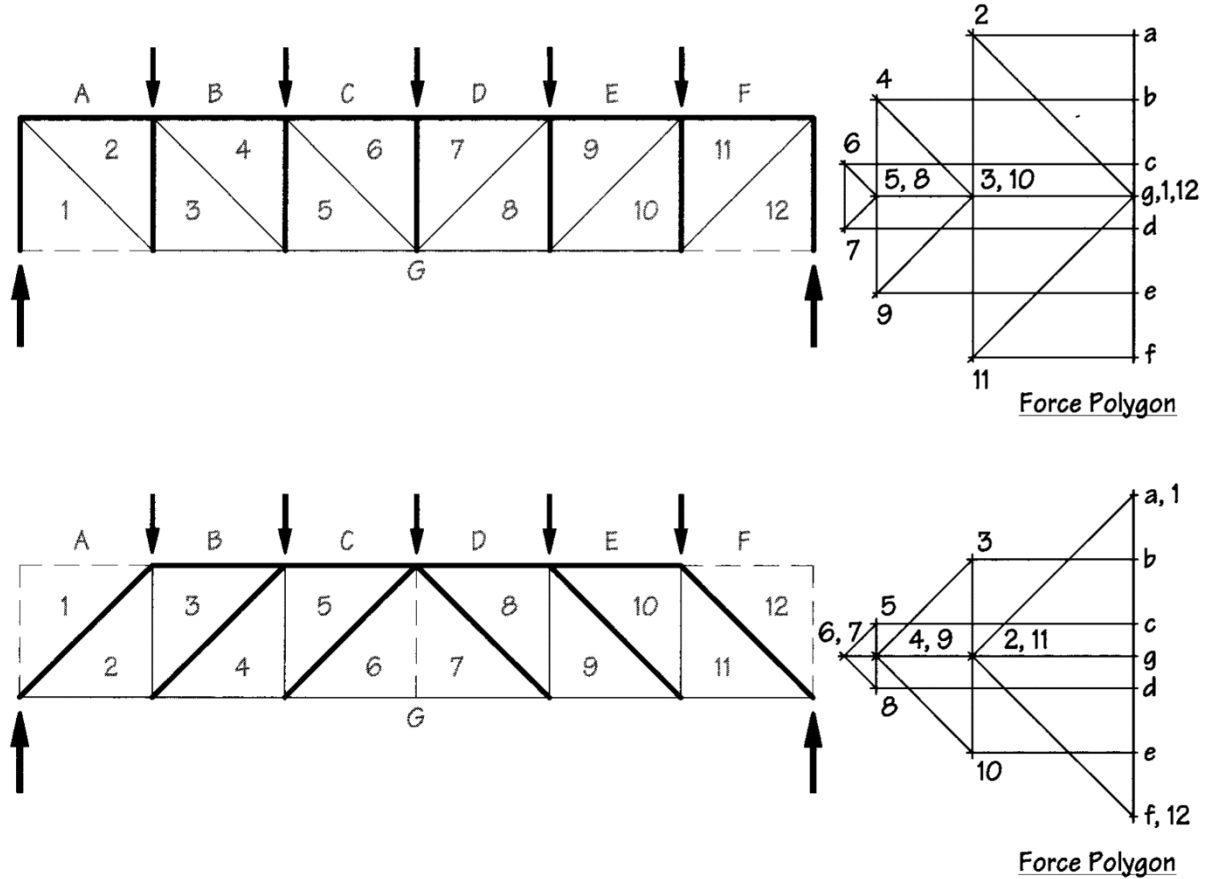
Reversing the direction of the diagonal members: a flat Pratt truss above, a flat Howe truss below.
